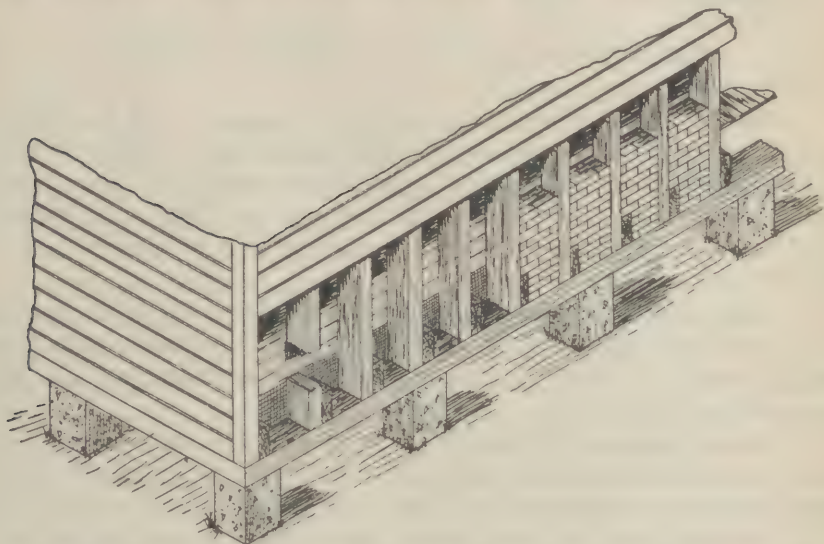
(Schematic). Rat proofing by elevation, with closure of openings between studding with brick.
